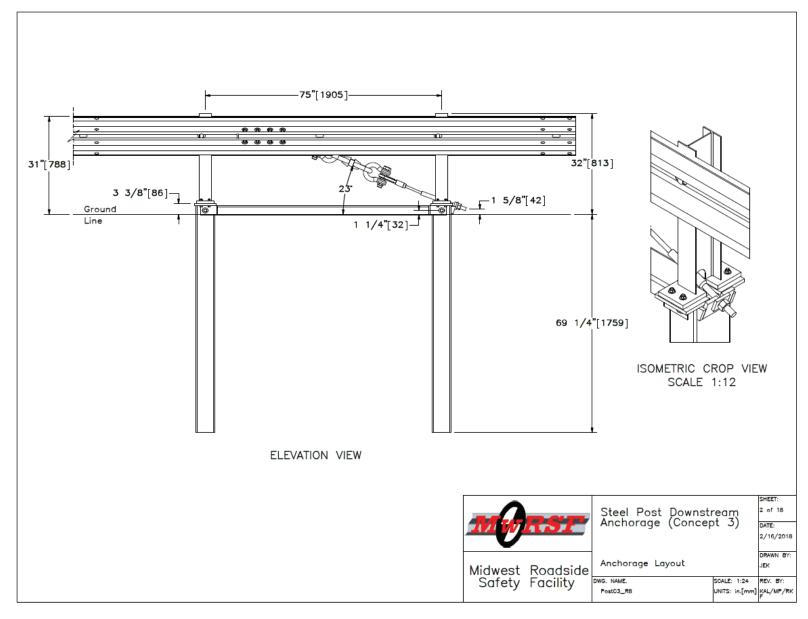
Steel Post, Trailing-End Anchorage System, Concept No. 3 – Anchorage Layout
